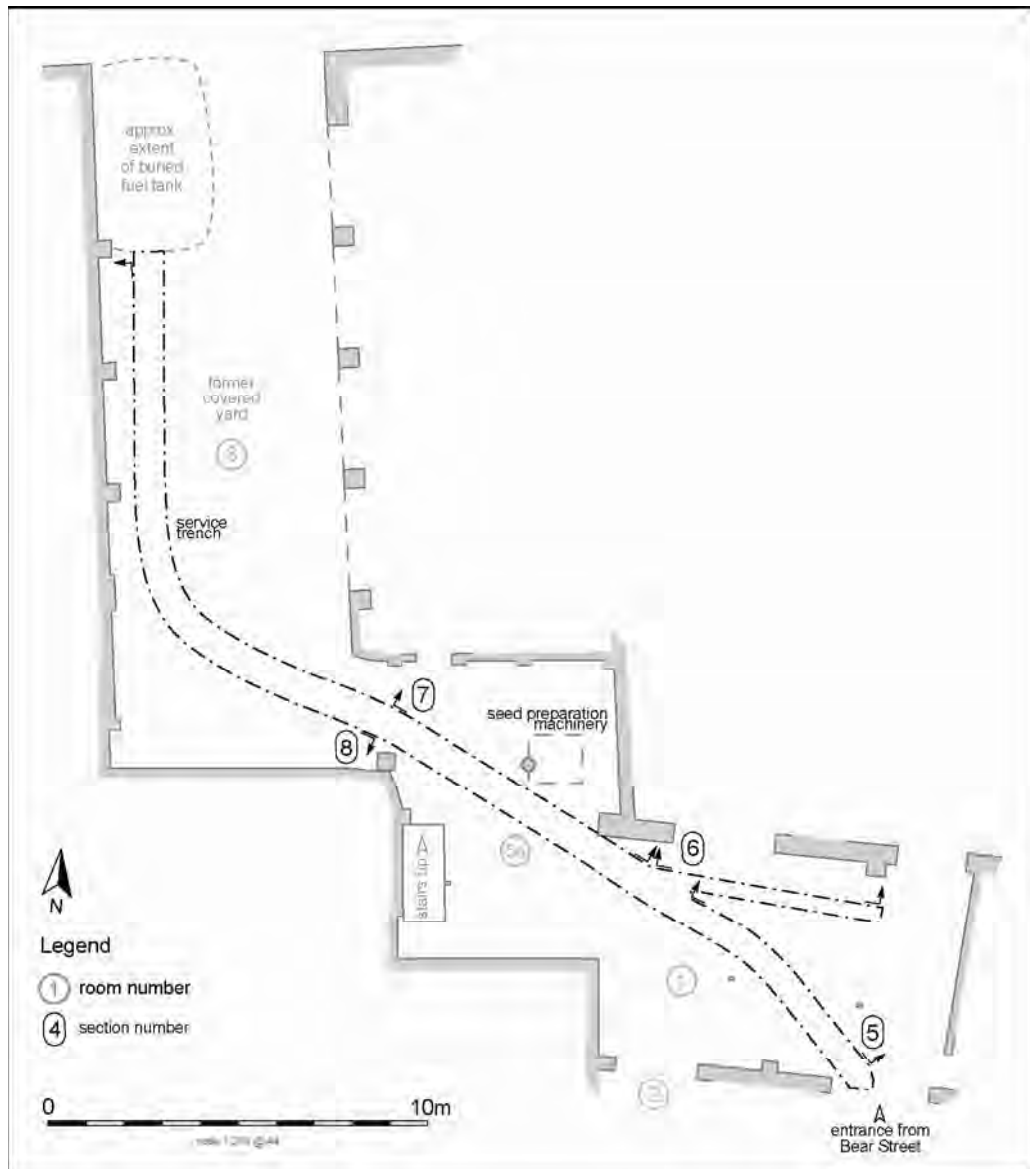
Plan of Trench Four through the buildings of 26 Bear Street.
